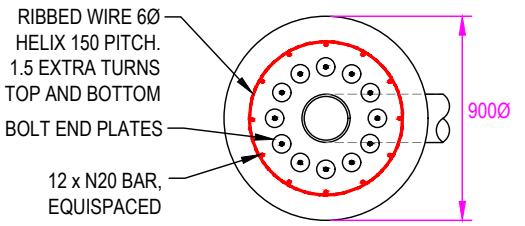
C: BASE PILE (PLAN SECTION C)
